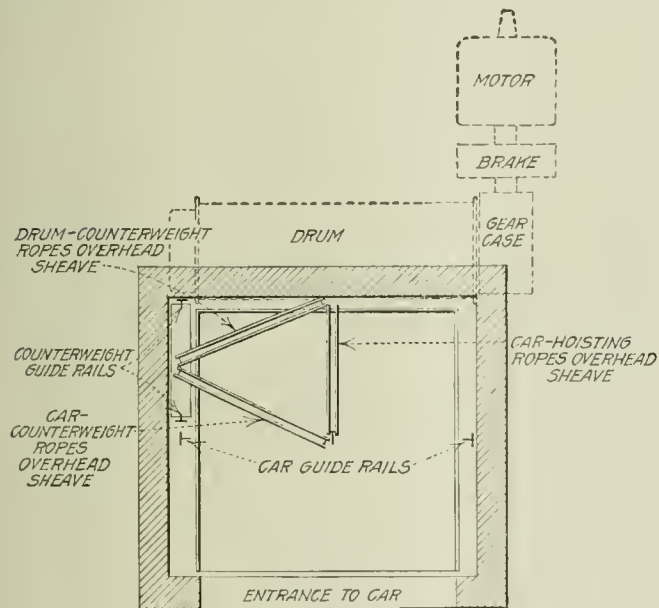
LOCATION OF OVERHEAD SHEAVES WHEN MACHINE IS PLACED AT RIGHT ANGLES TO COUNTERWEIGHTS
